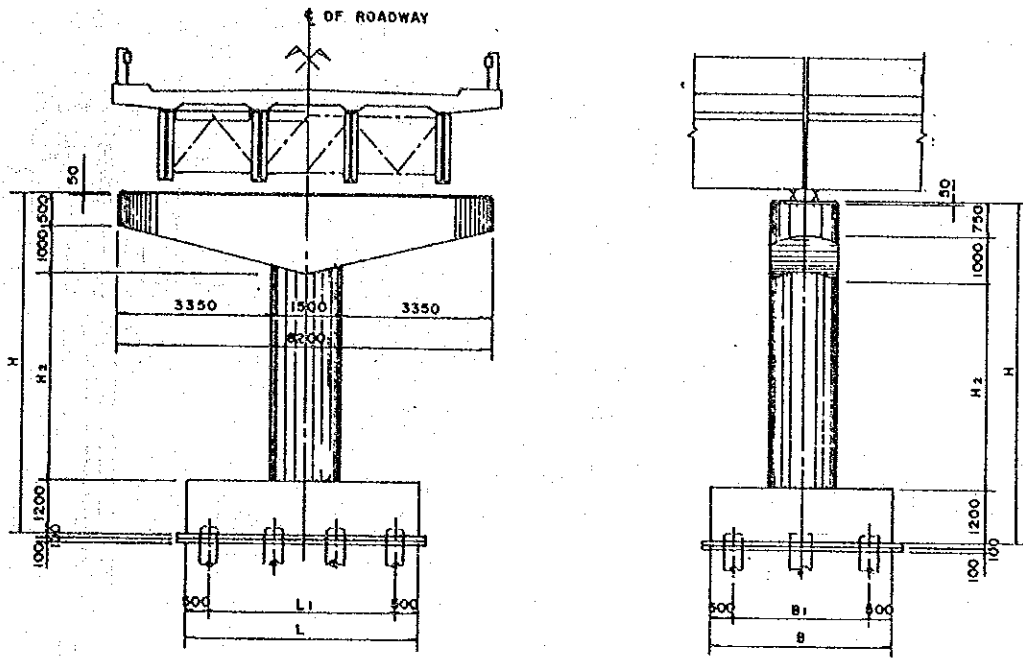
(3/5) TYPICAL PIER (SPAN LENGTH; 26m~32m)
